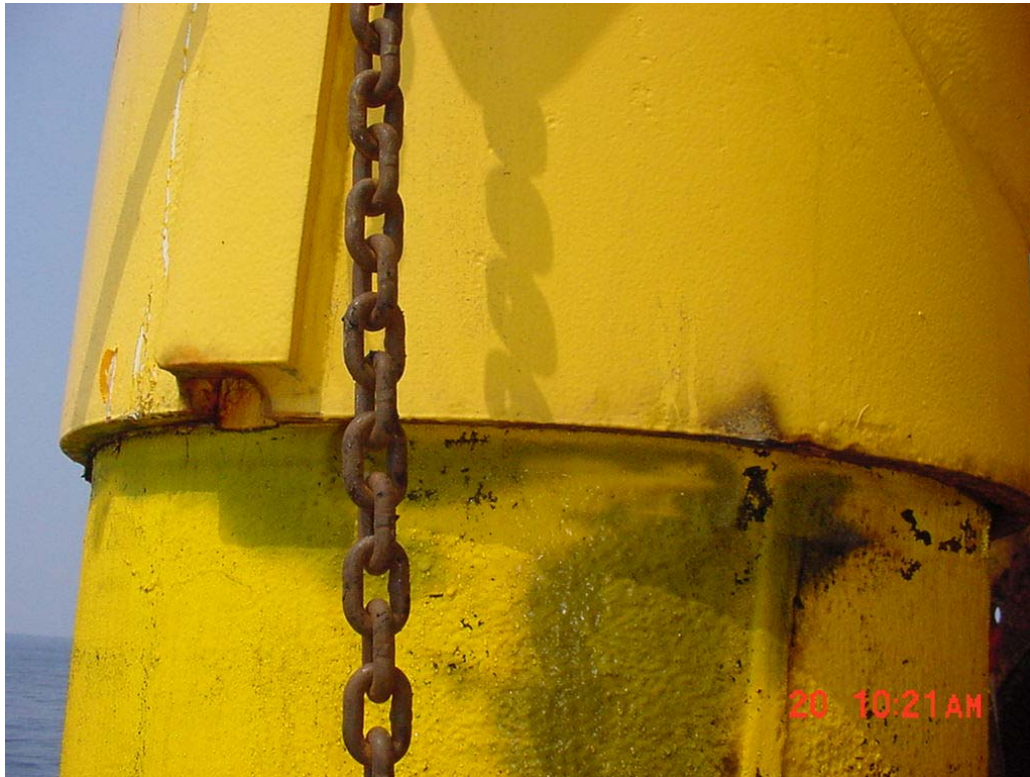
A conventional riser repair involving a welded steel clamp
